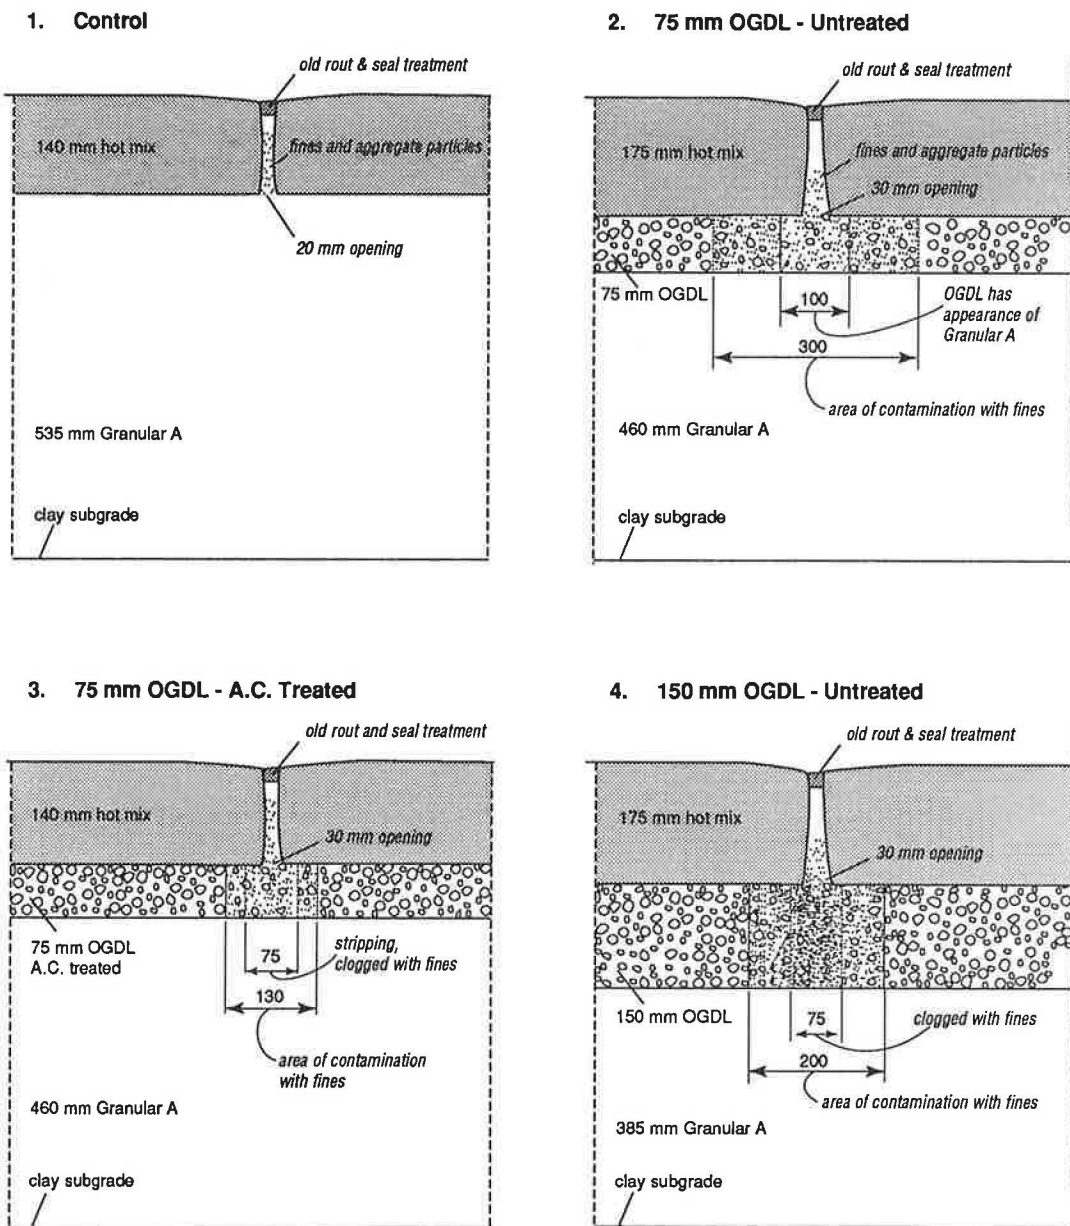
Typical condition of full transverse cracks, Highway 56.
